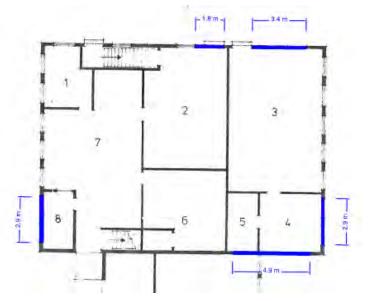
Maintenance Building Ground Floor Plan – Proposed 67% Strengthening
